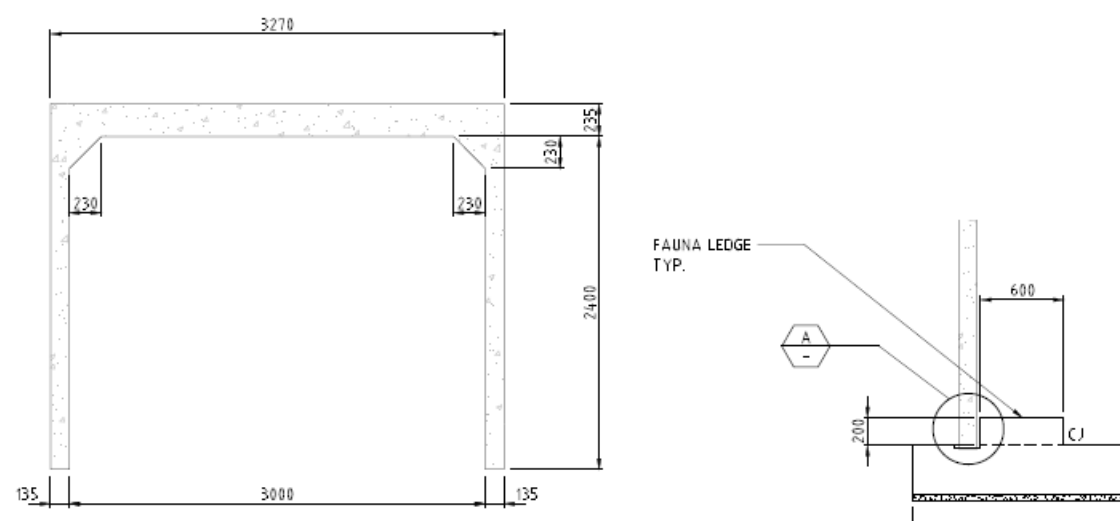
Cross section of the proposed culvert at Badgerys Creek
